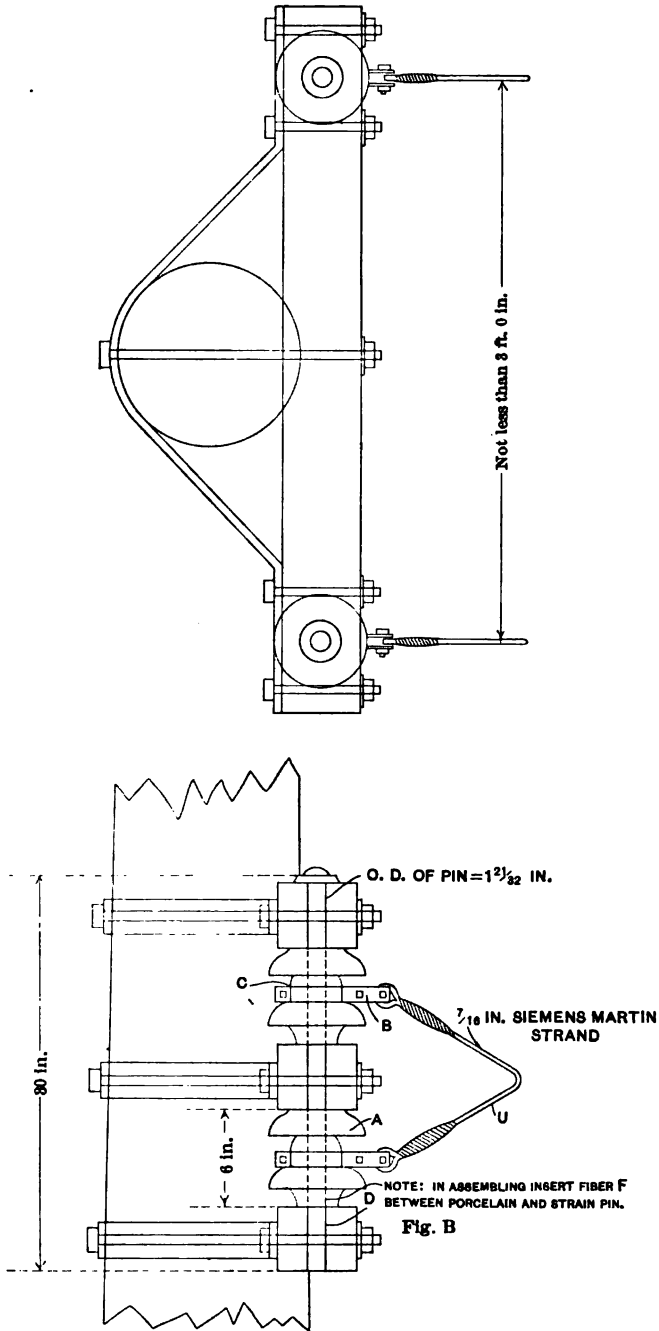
Detail B of Fig. 17 showing method of attachment of cross-catenary to pole
